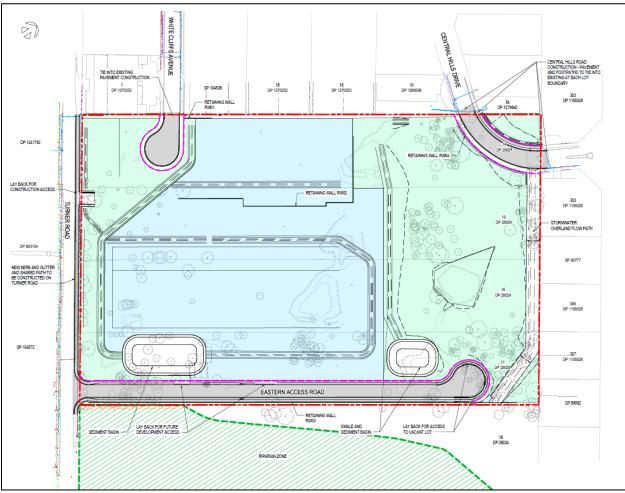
General Arrangement Plan (Source: ARUP, 2024)
